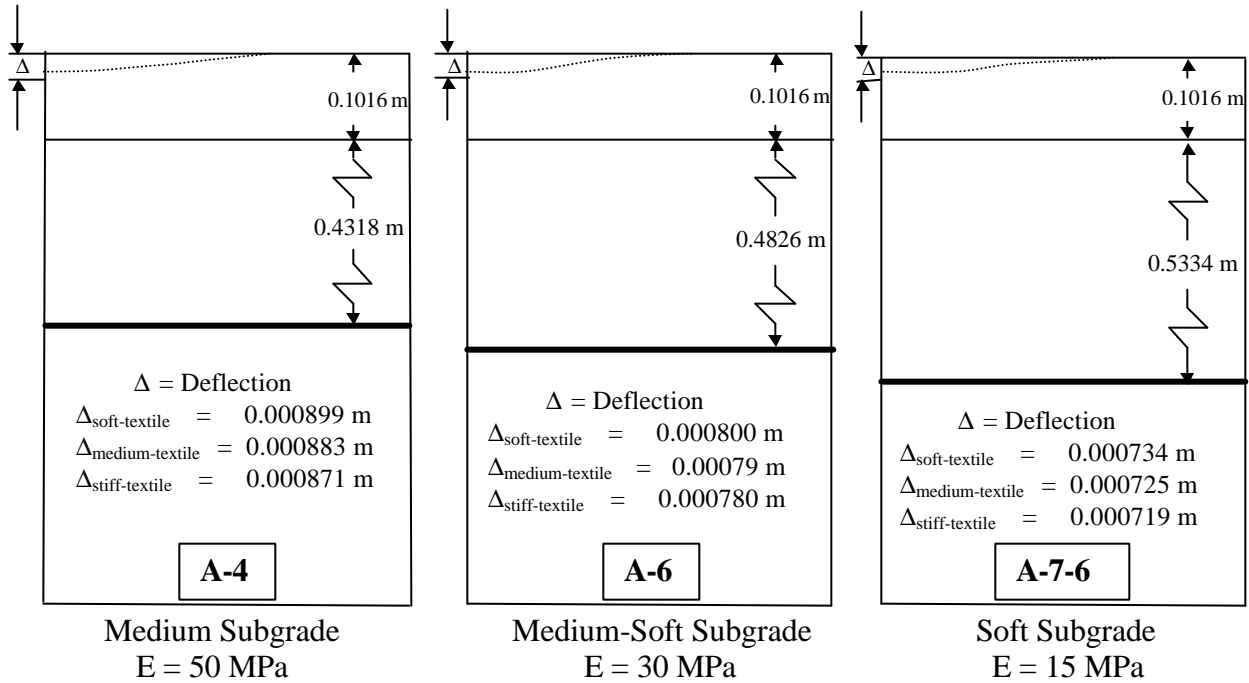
Road cross-sections and deflections for 150-300 HCADT structure, surfaced, 40° C
